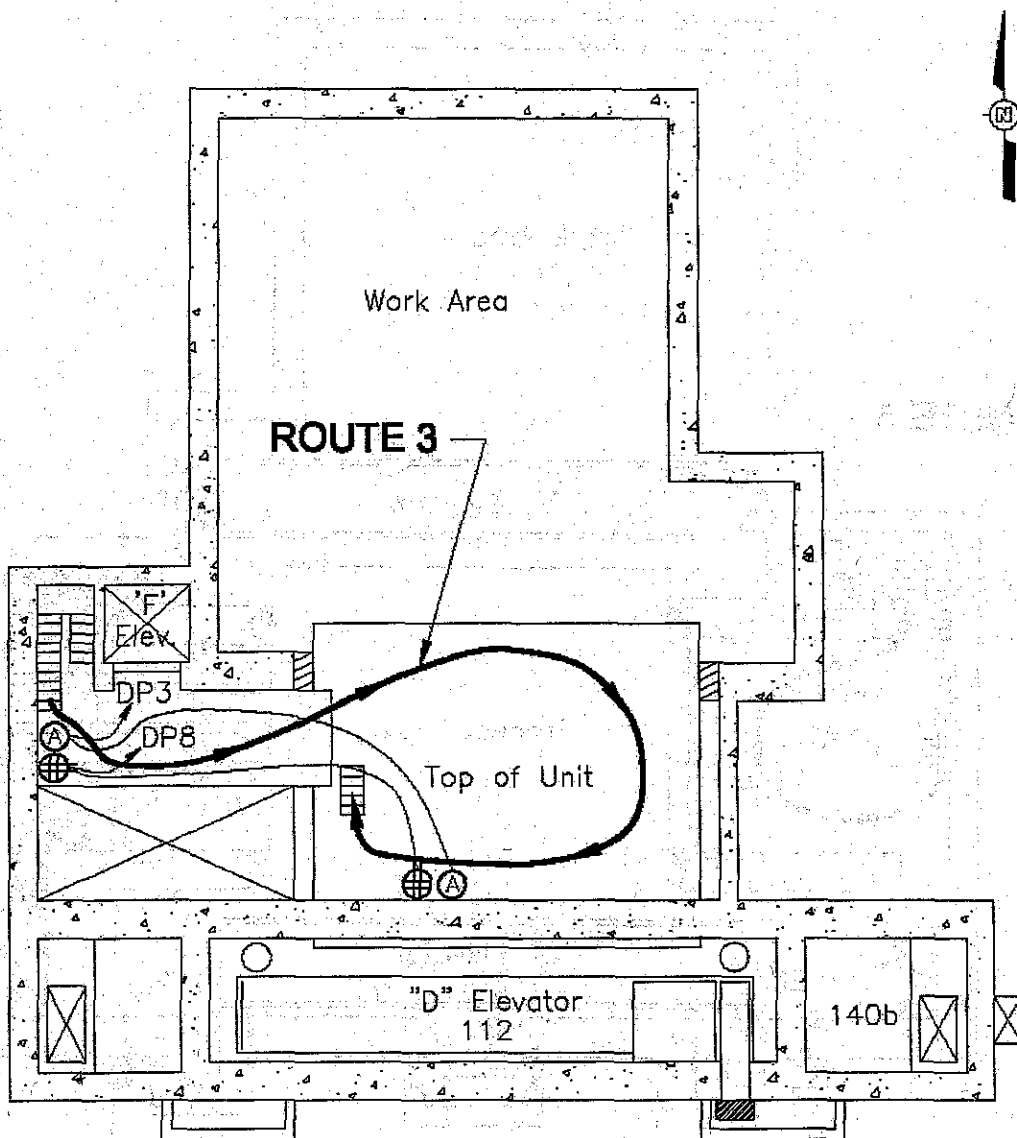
Surveillance and Inspection Route (Elevation 23 ft 4 in.).
